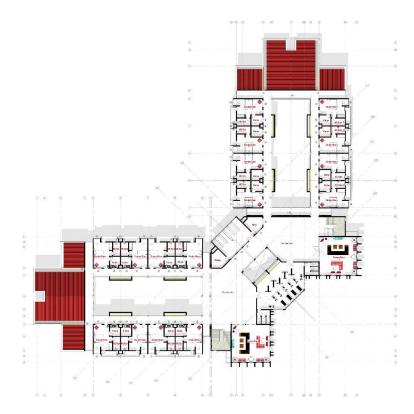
An architectural illustration of second floor plan. Source: Author's field work (2023)
